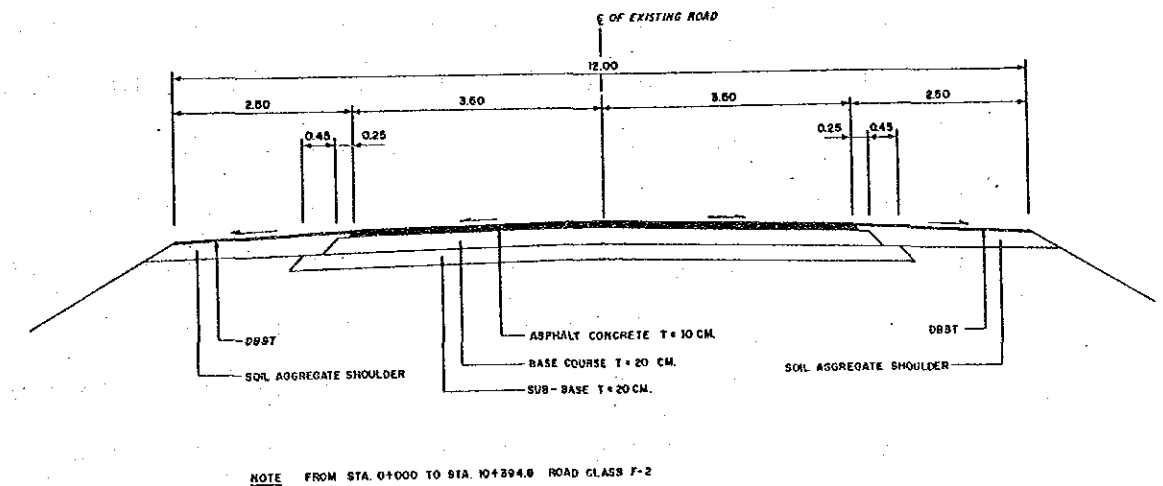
FIGURE TYPICAL PAVEMENT STRUCTURE FOR FLEXIBLE PAVEMENT IM-15
